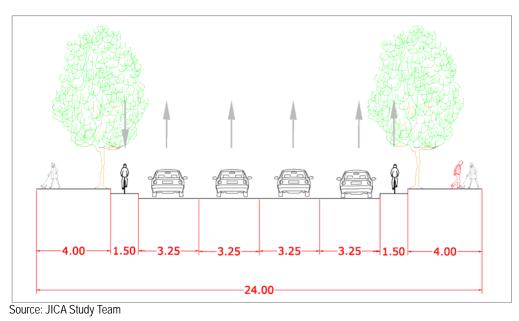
Typical Primary Road Cross Section (RUT 1-3-1)
